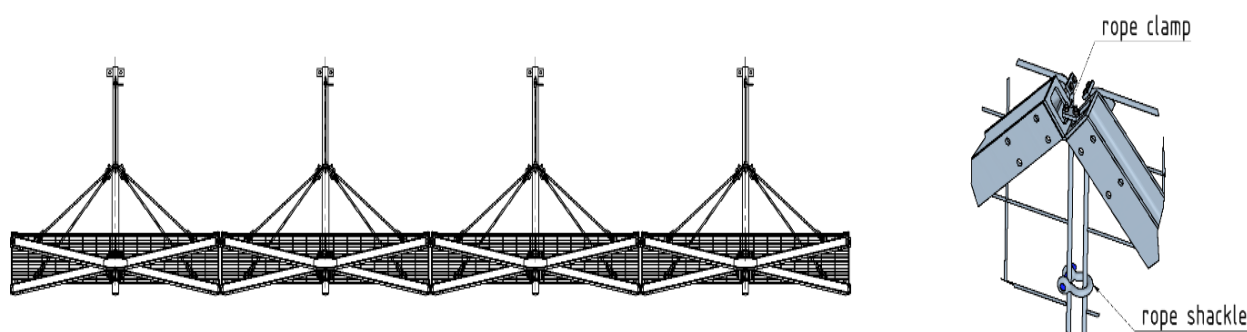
One row installation of high load-bearing earth retaining structures; connection with rope clamps and rope shackles
